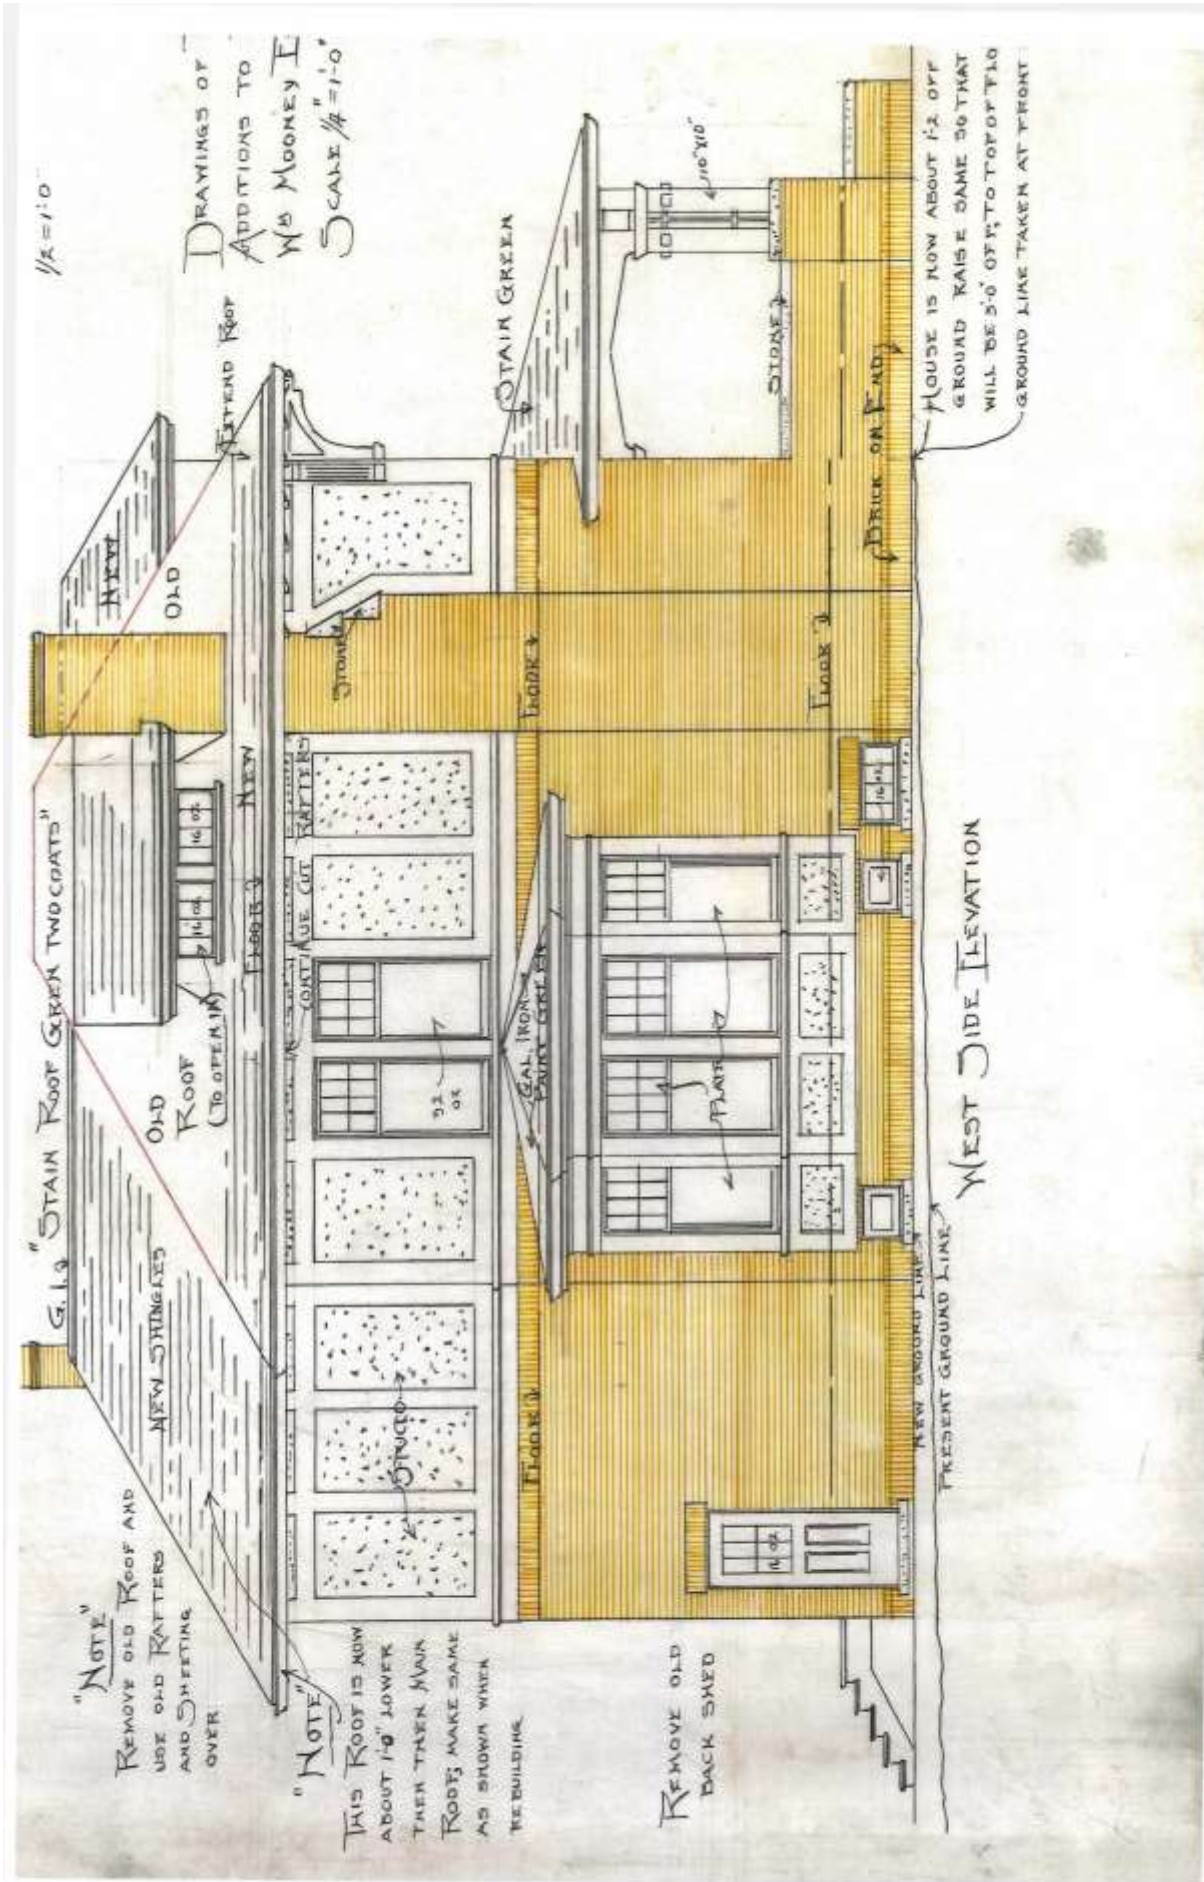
Detail of the undated (circa 1920s) architectural drawings for the property at 562 Dufferin Avenue, showing the west elevation of the building (note: no details of the front/south elevation have been located). Note the half timbering details shown, as well as the window fenestration style. Submitted as part of the Heritage Alteration Permit application.
